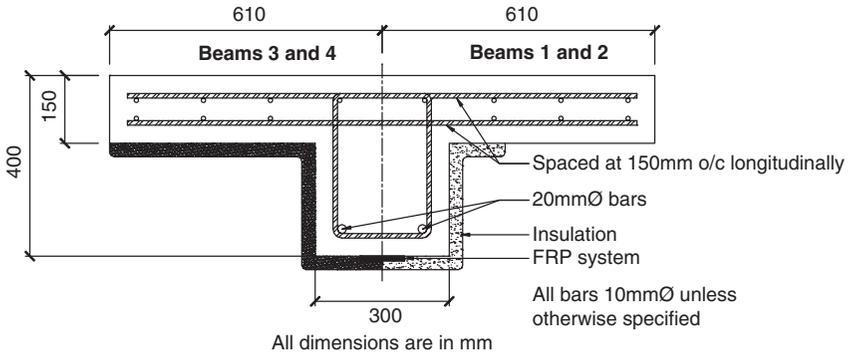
Overall dimensions, reinforcement details, FRP-strengthening scheme, and insulation scheme for beam-slab assemblies [27].
